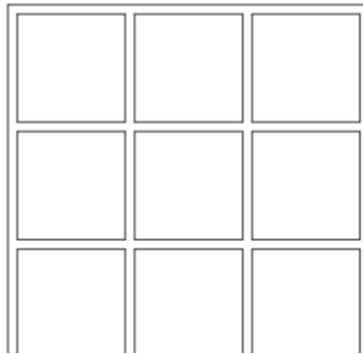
Supporting arrangement of screed within insulation layer in the system with continuous concrete strips (plan view)
